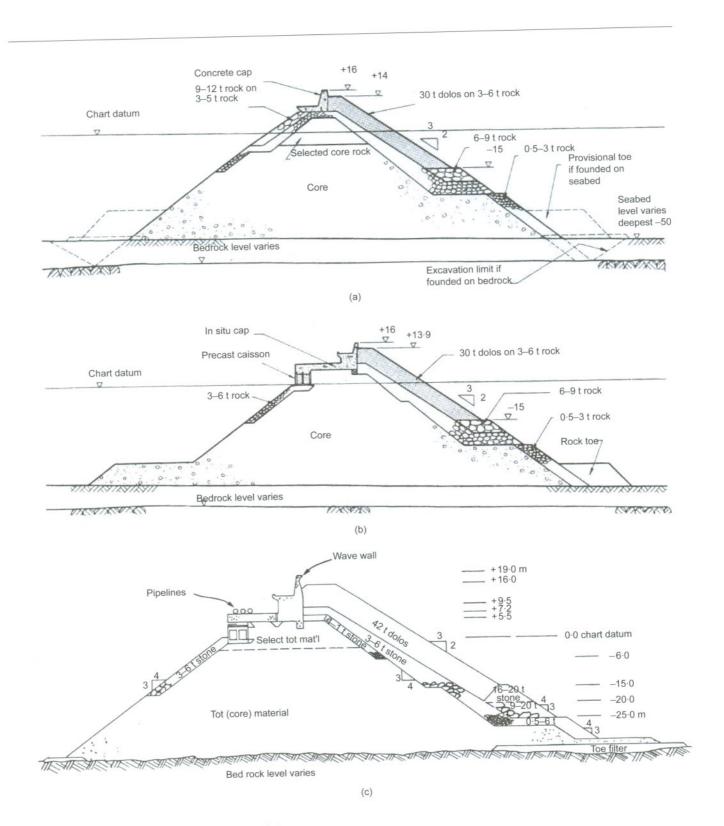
Breakwater cross-sections: (a) tender design; (b) contractor's alternative; (c) final design (after Mettam, 1976; Port Sines Investigating Panel, 1982) (elevations in m above chart datum)
